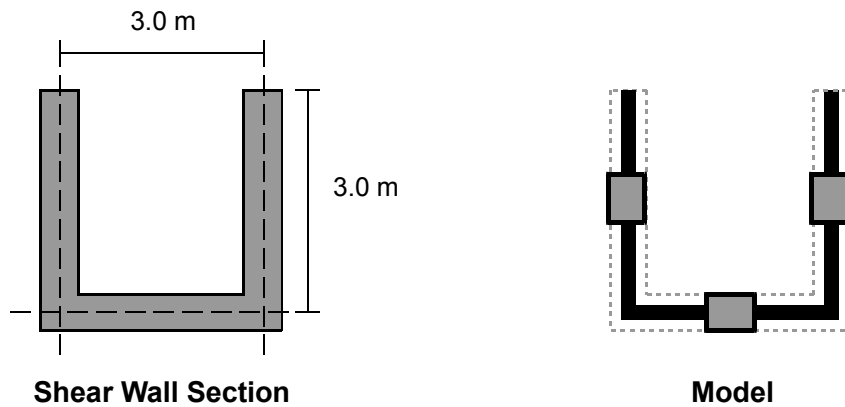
Plan of a U-Shaped Shear Wall Assembly and Its Proposed Model
